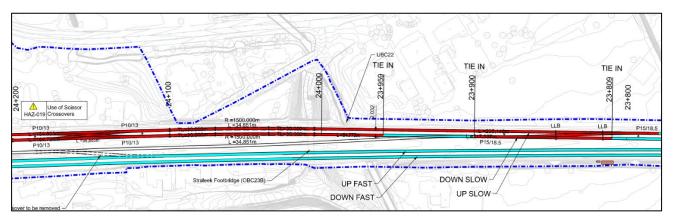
Hazelhatch & Celbridge Station – Track Plan Layout (3 of 3)
